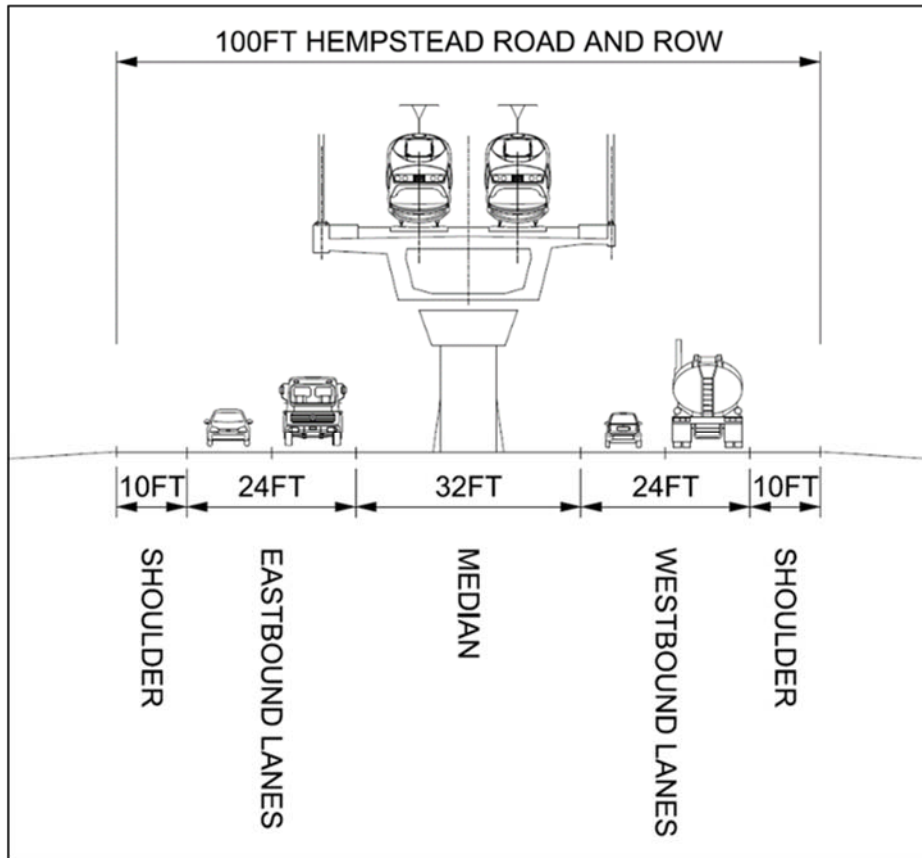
Hempstead Road Configuration 2 – Viaduct Location between Intersections
